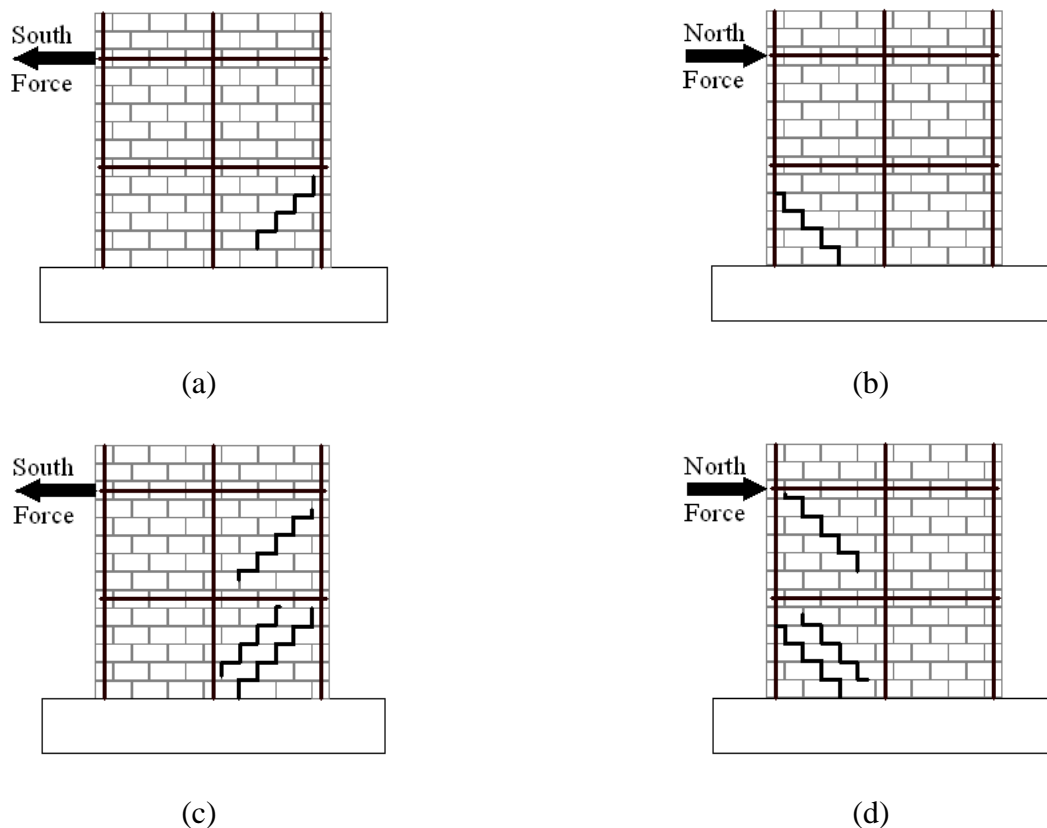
Typical location for (a/b) first stair-step crack and (c/d) second stair-step crack in lower panel and first crack in upper panel, for the indicated direction of force application
